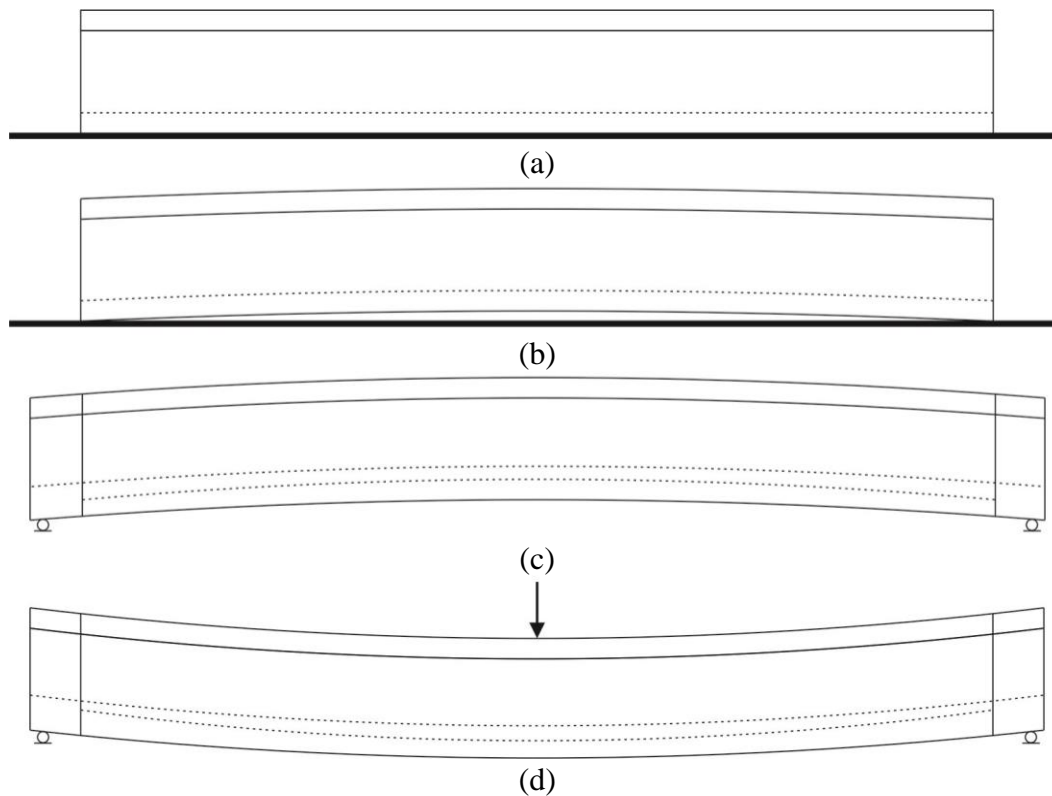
Construction stages for simply-supported beams: (a) application of gravity to girder placed over prestressing bed, (b) pretensioning, (c) addition of end blocks and post-tensioning, (d) external loads
